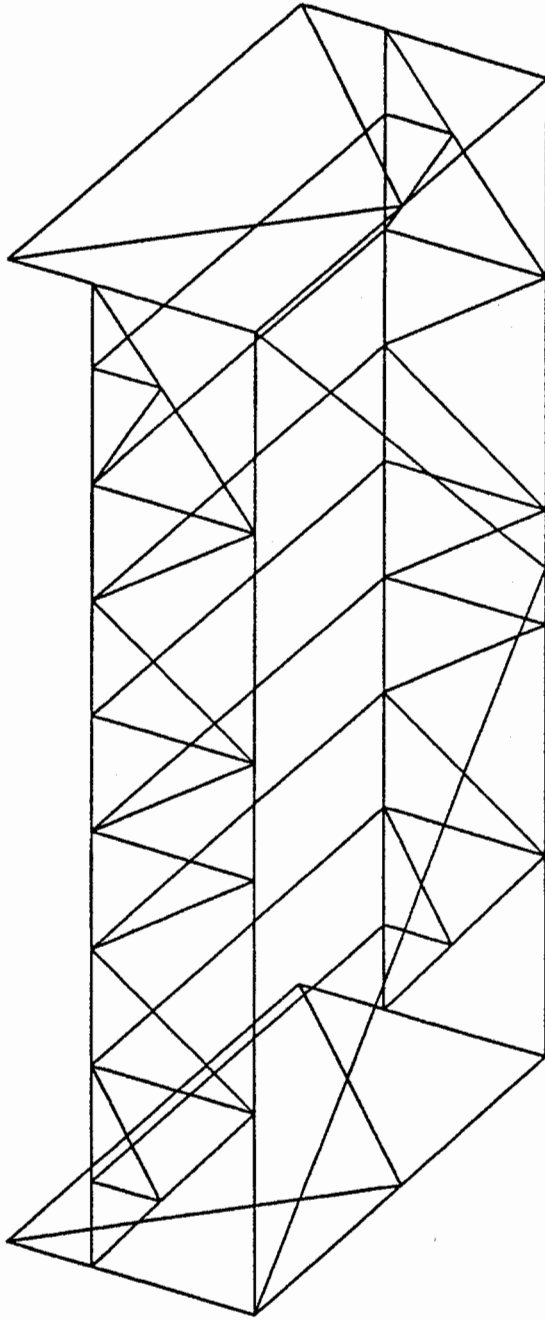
Stiffening Truss and Floor Truss System including Longitudinal Stringers
